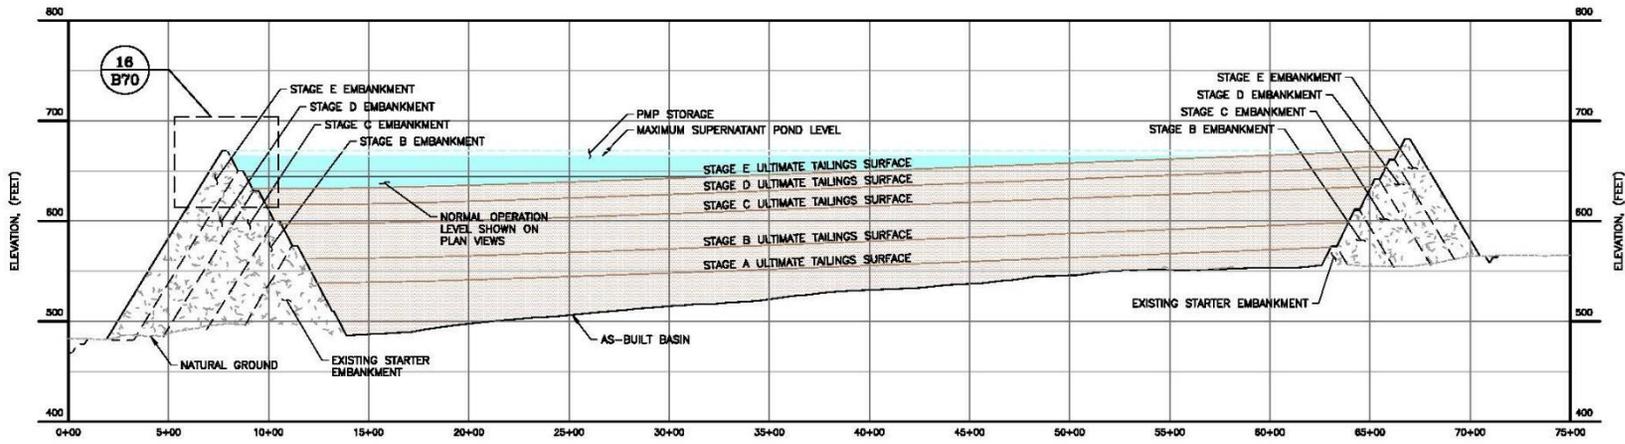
Cross Section of the Tailings Storage Facility Embankment Showing the Stages of Construction
